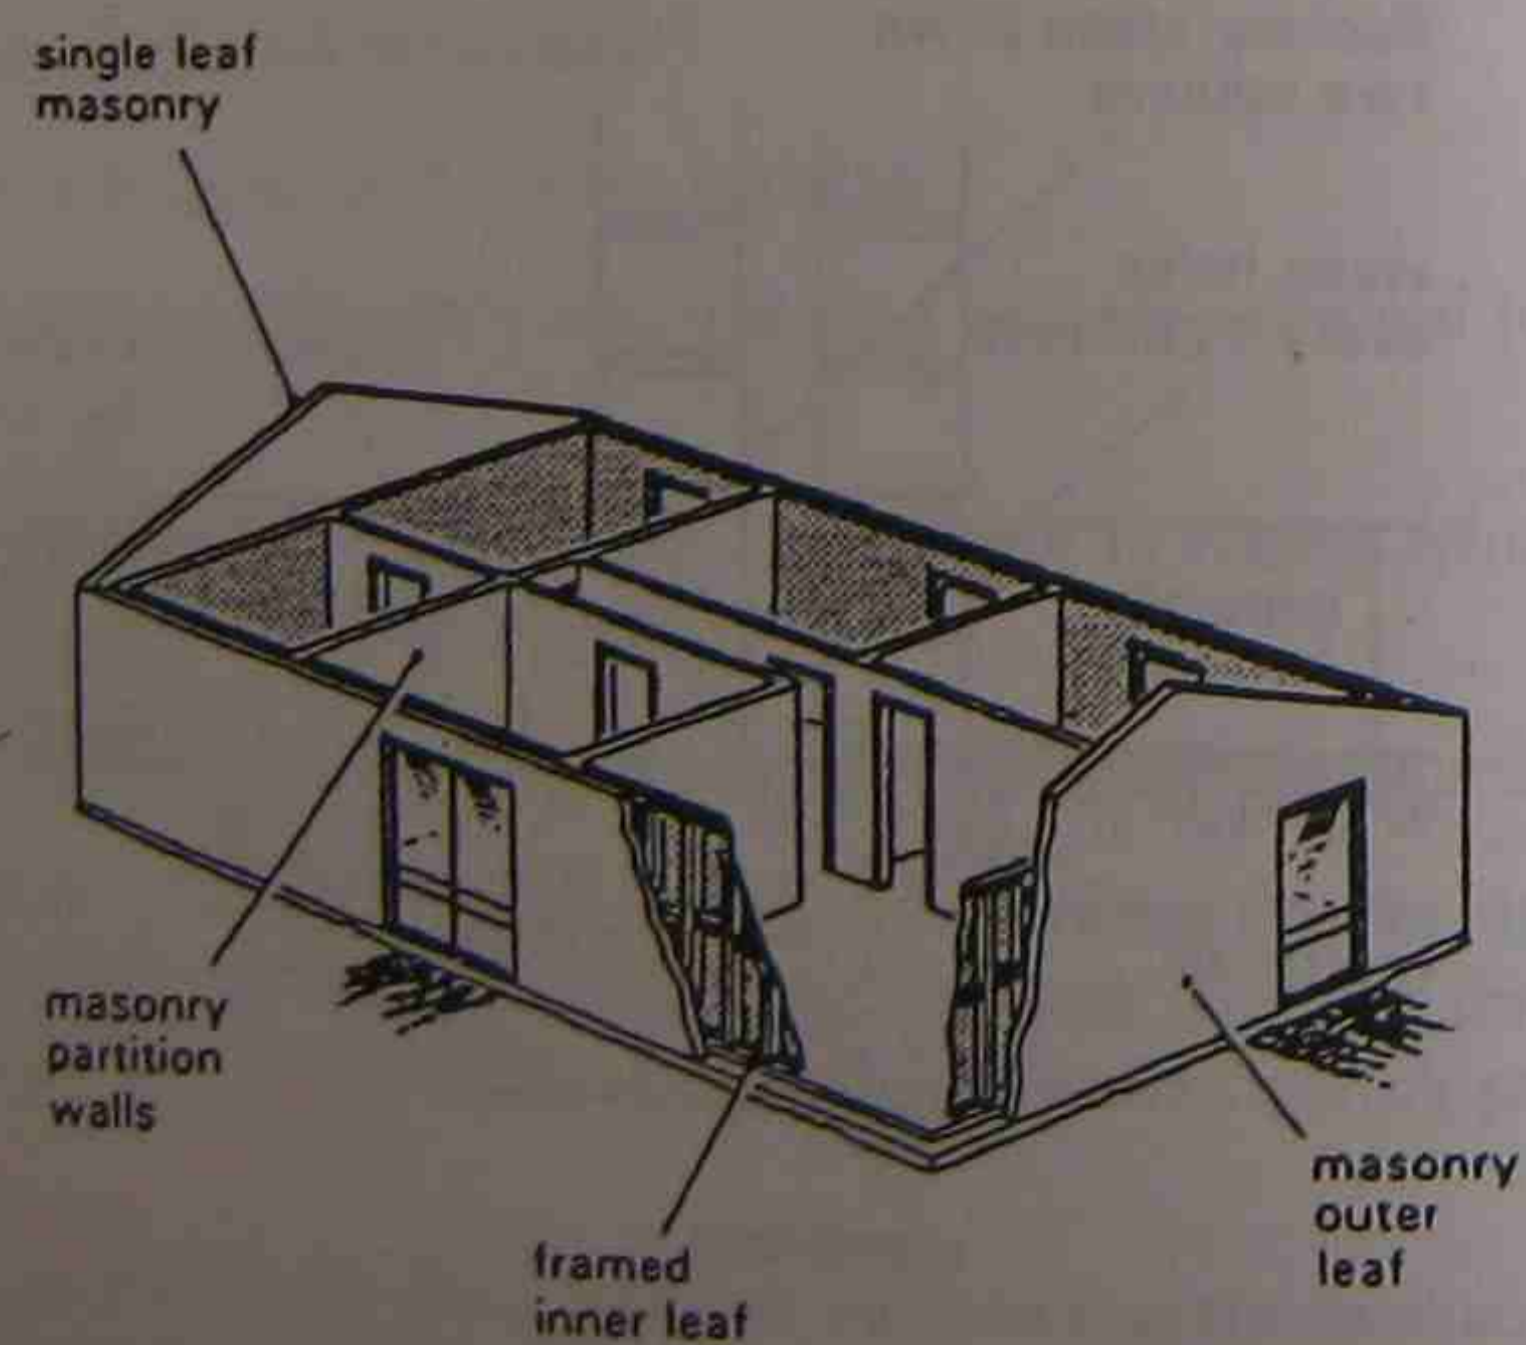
Masonry core construction. (Source: Glass, Mass and Insulation Council, 1985).
